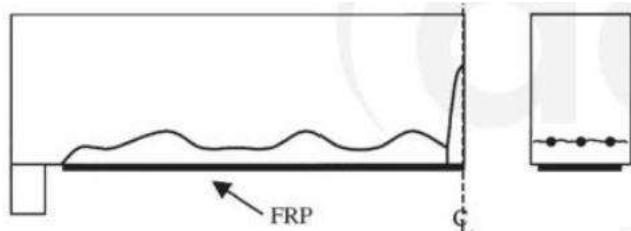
Delamination caused by tension failure of the concrete cover:
